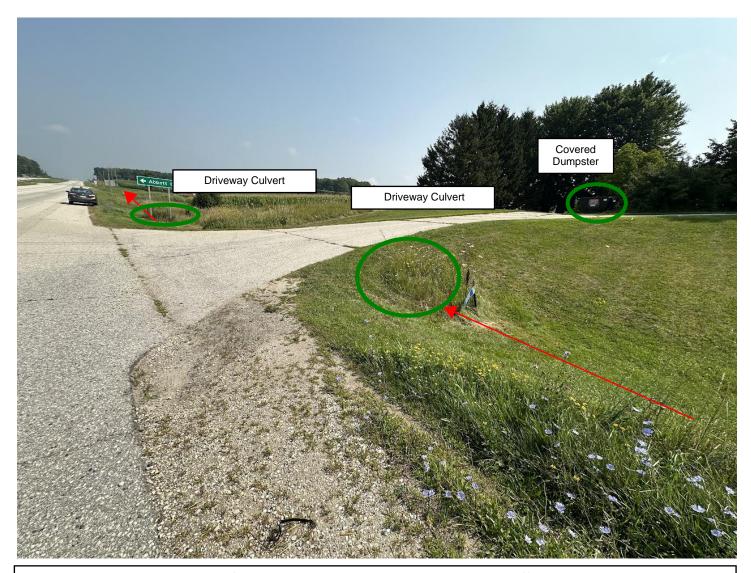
' north of site. Driveway culverts direct runoff into the roadside ditch, with flow continuing north along the ditch line.
